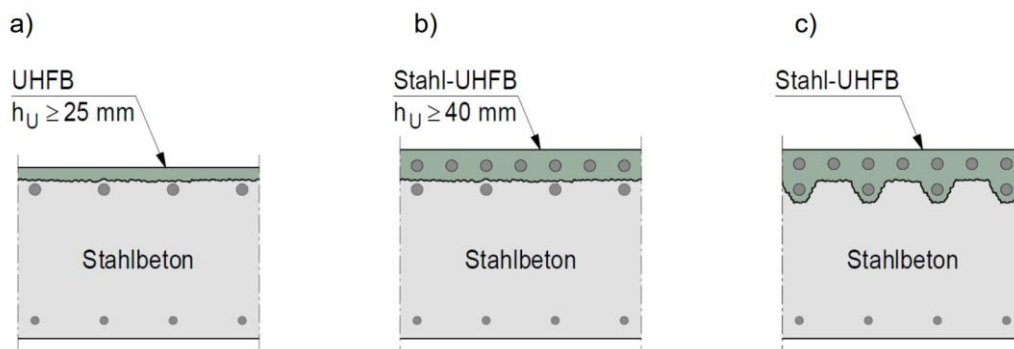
Typical configurations combining UHFB and reinforced concrete. A: UHFB as protective layer, B: Stahl-UHFB as reinforcing (Stahl-) and protective layer, C: Stahl-UHFB used for rehabilitation of corrosion damage of existing rebars and reinforcing layer [12].
